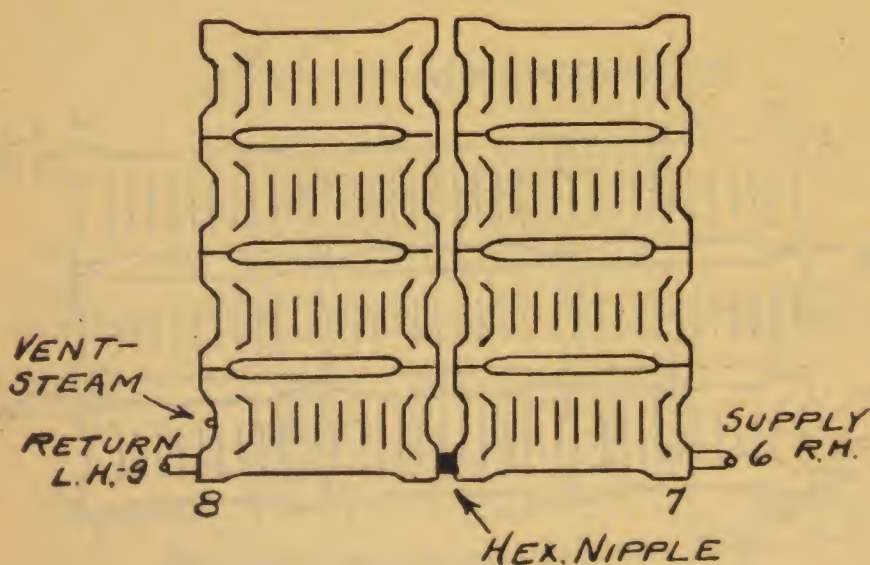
Assembled in two or more stacks. One and two pipe steam only. Bottom feed only.
